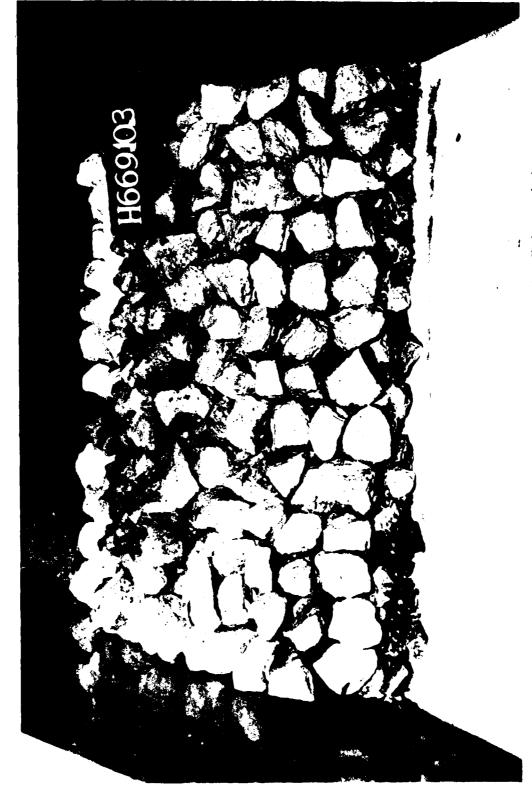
Landside view of Plan 7 after testing Hydrograph A
